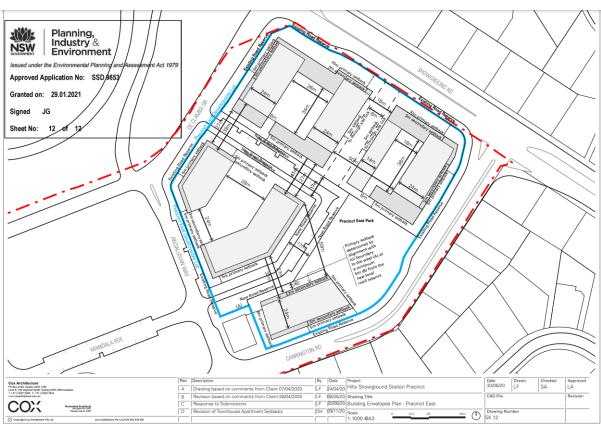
Extract of Building Envelope Plan approved under SSDA9653.
